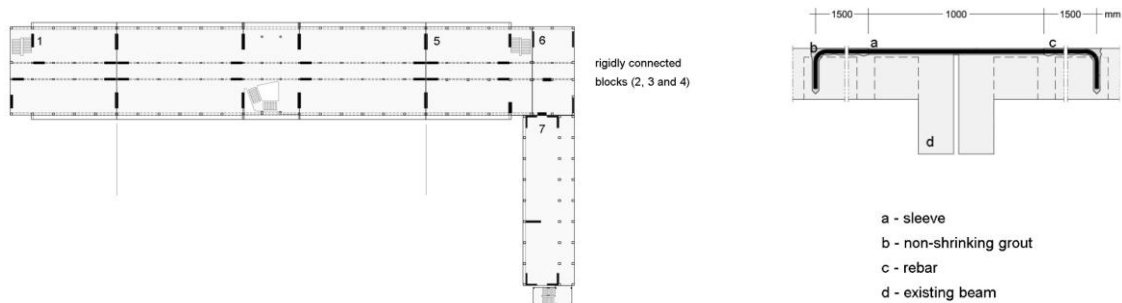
Examples of location and orientation of RC shear walls and elastic connection between blocks (ARA)
